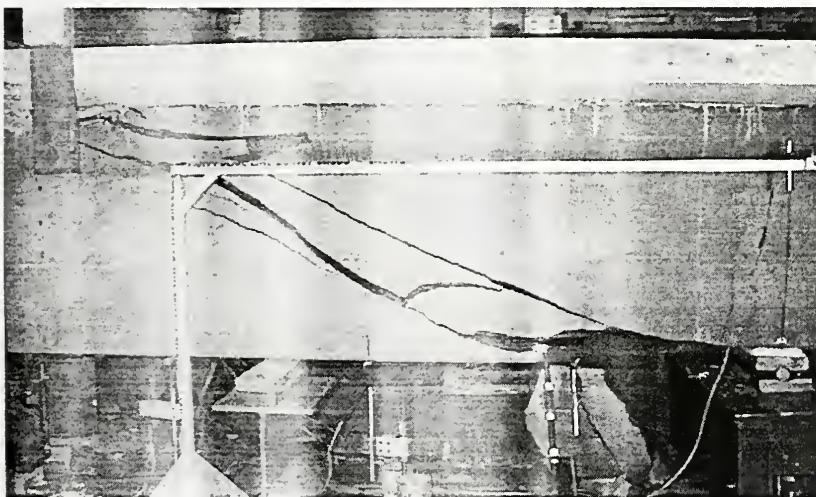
Web-Shear Crack in South Shear Span, Specimen PC10S, West Side
